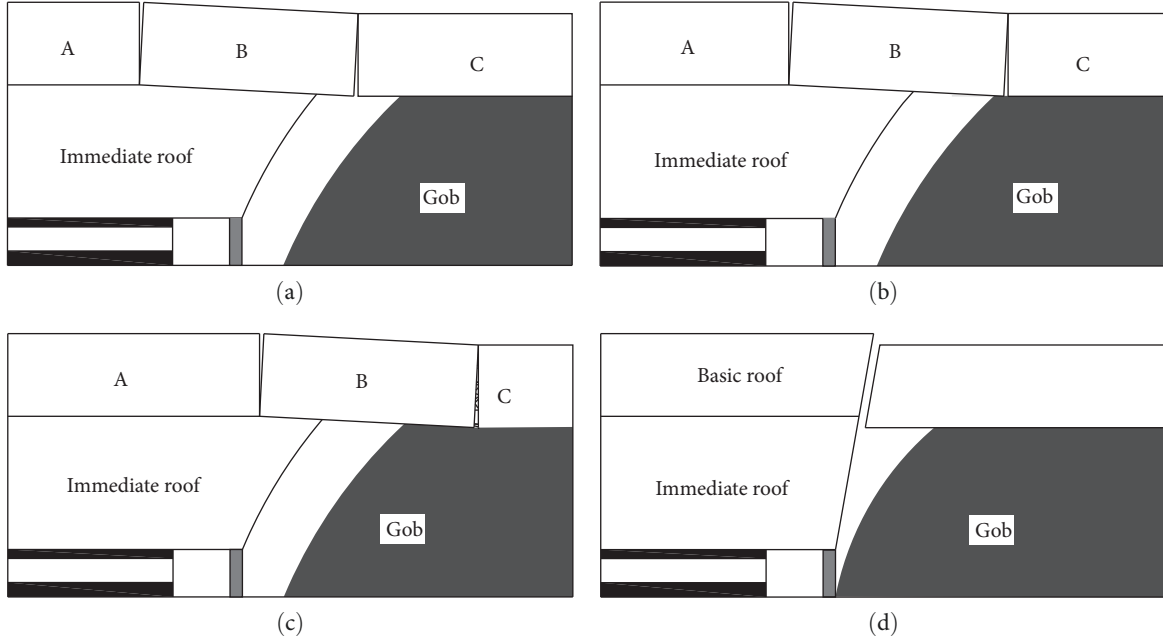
Location of roof rock breakage: (a) breakage above the solid coal side, (b) breakage above the roof of the roadway, (c) breaking above the mining area, and (d) breaking above the mining area after precracking and blasting.
